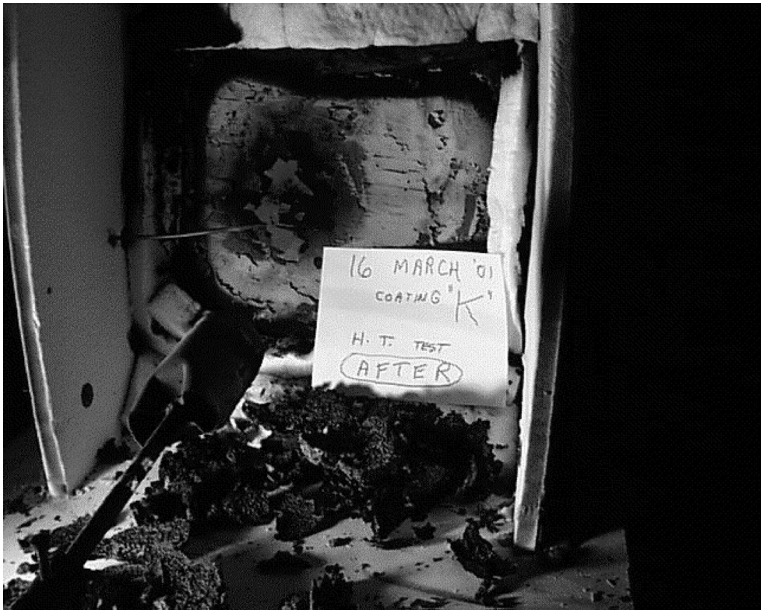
Coating K in the modified UL 1709 test with char pieces that fell off.
